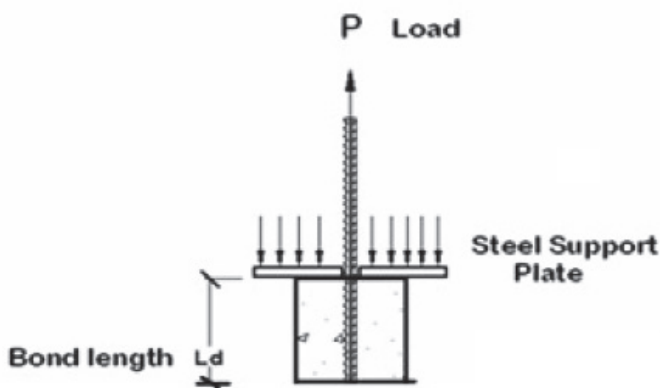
Sectional view & test setup on Universal Tensile Test Machine of 100 ton capacity
